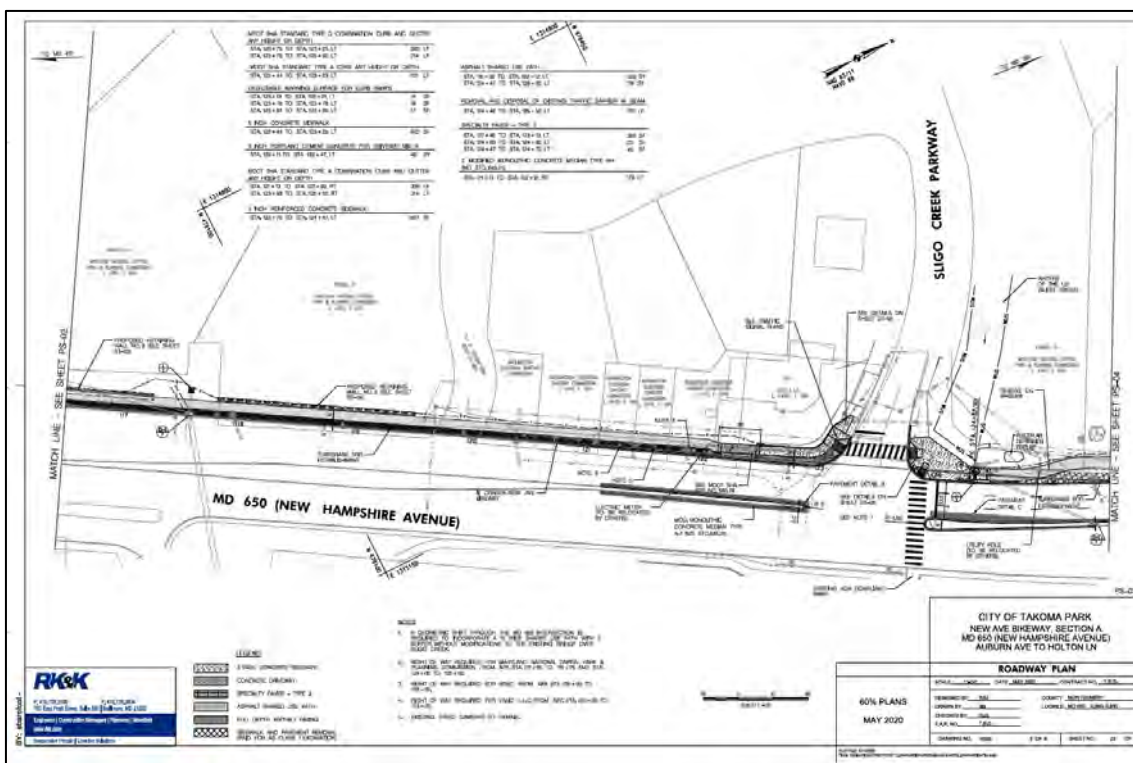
Plan View of Proposed New Avenue Section A Improvements (Part 3)
